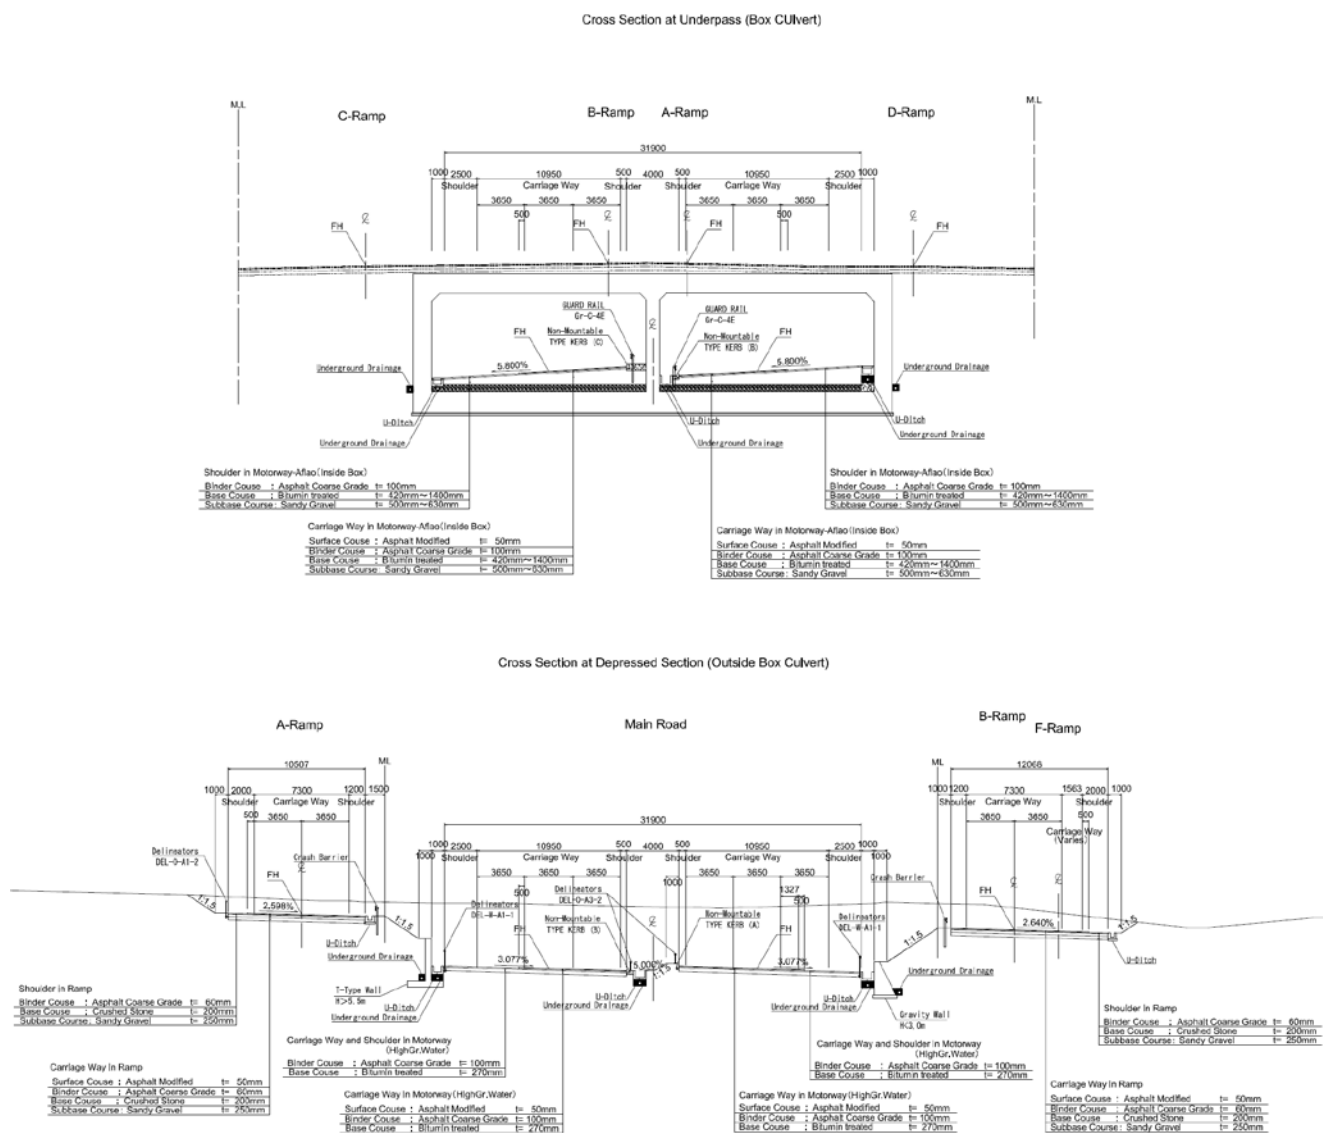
Motorway-Aflao Road: Typical Cross Section (2)
